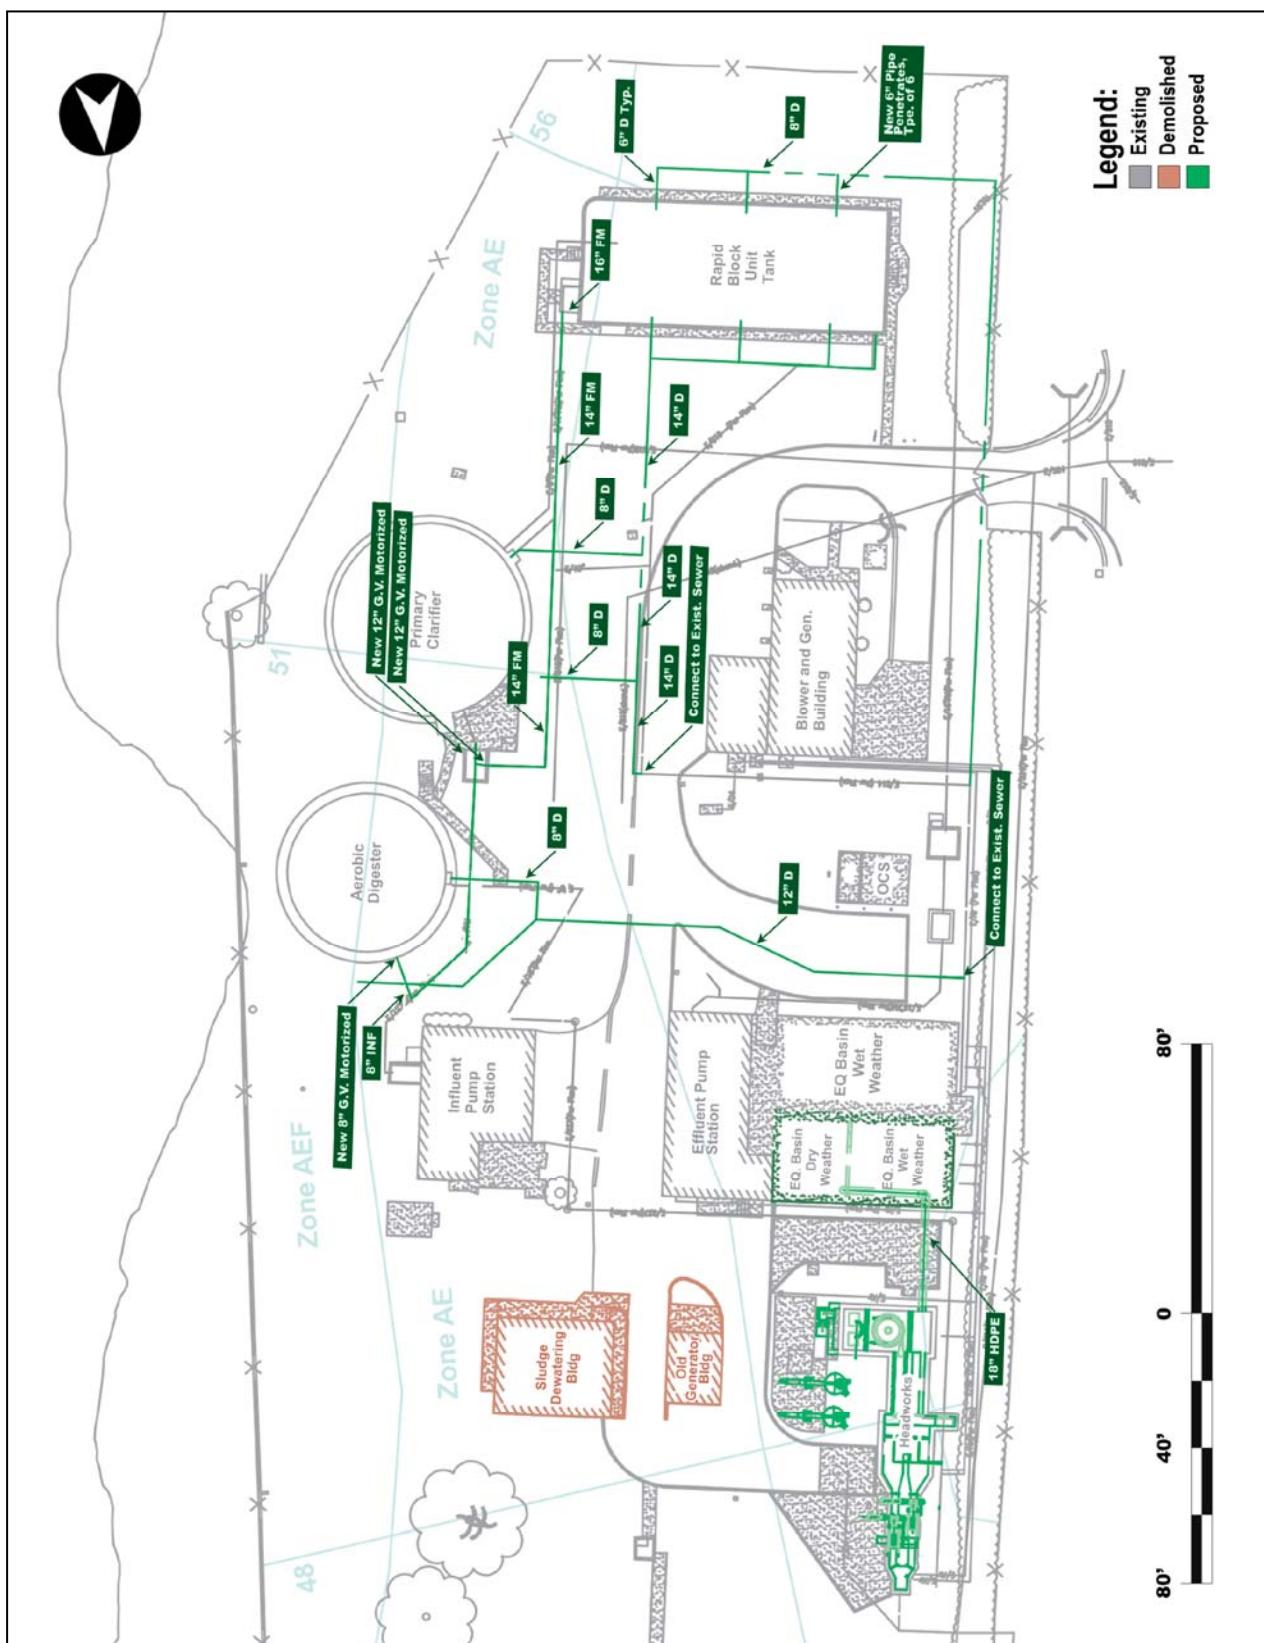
Option 1: Site and Yard Piping Plan
